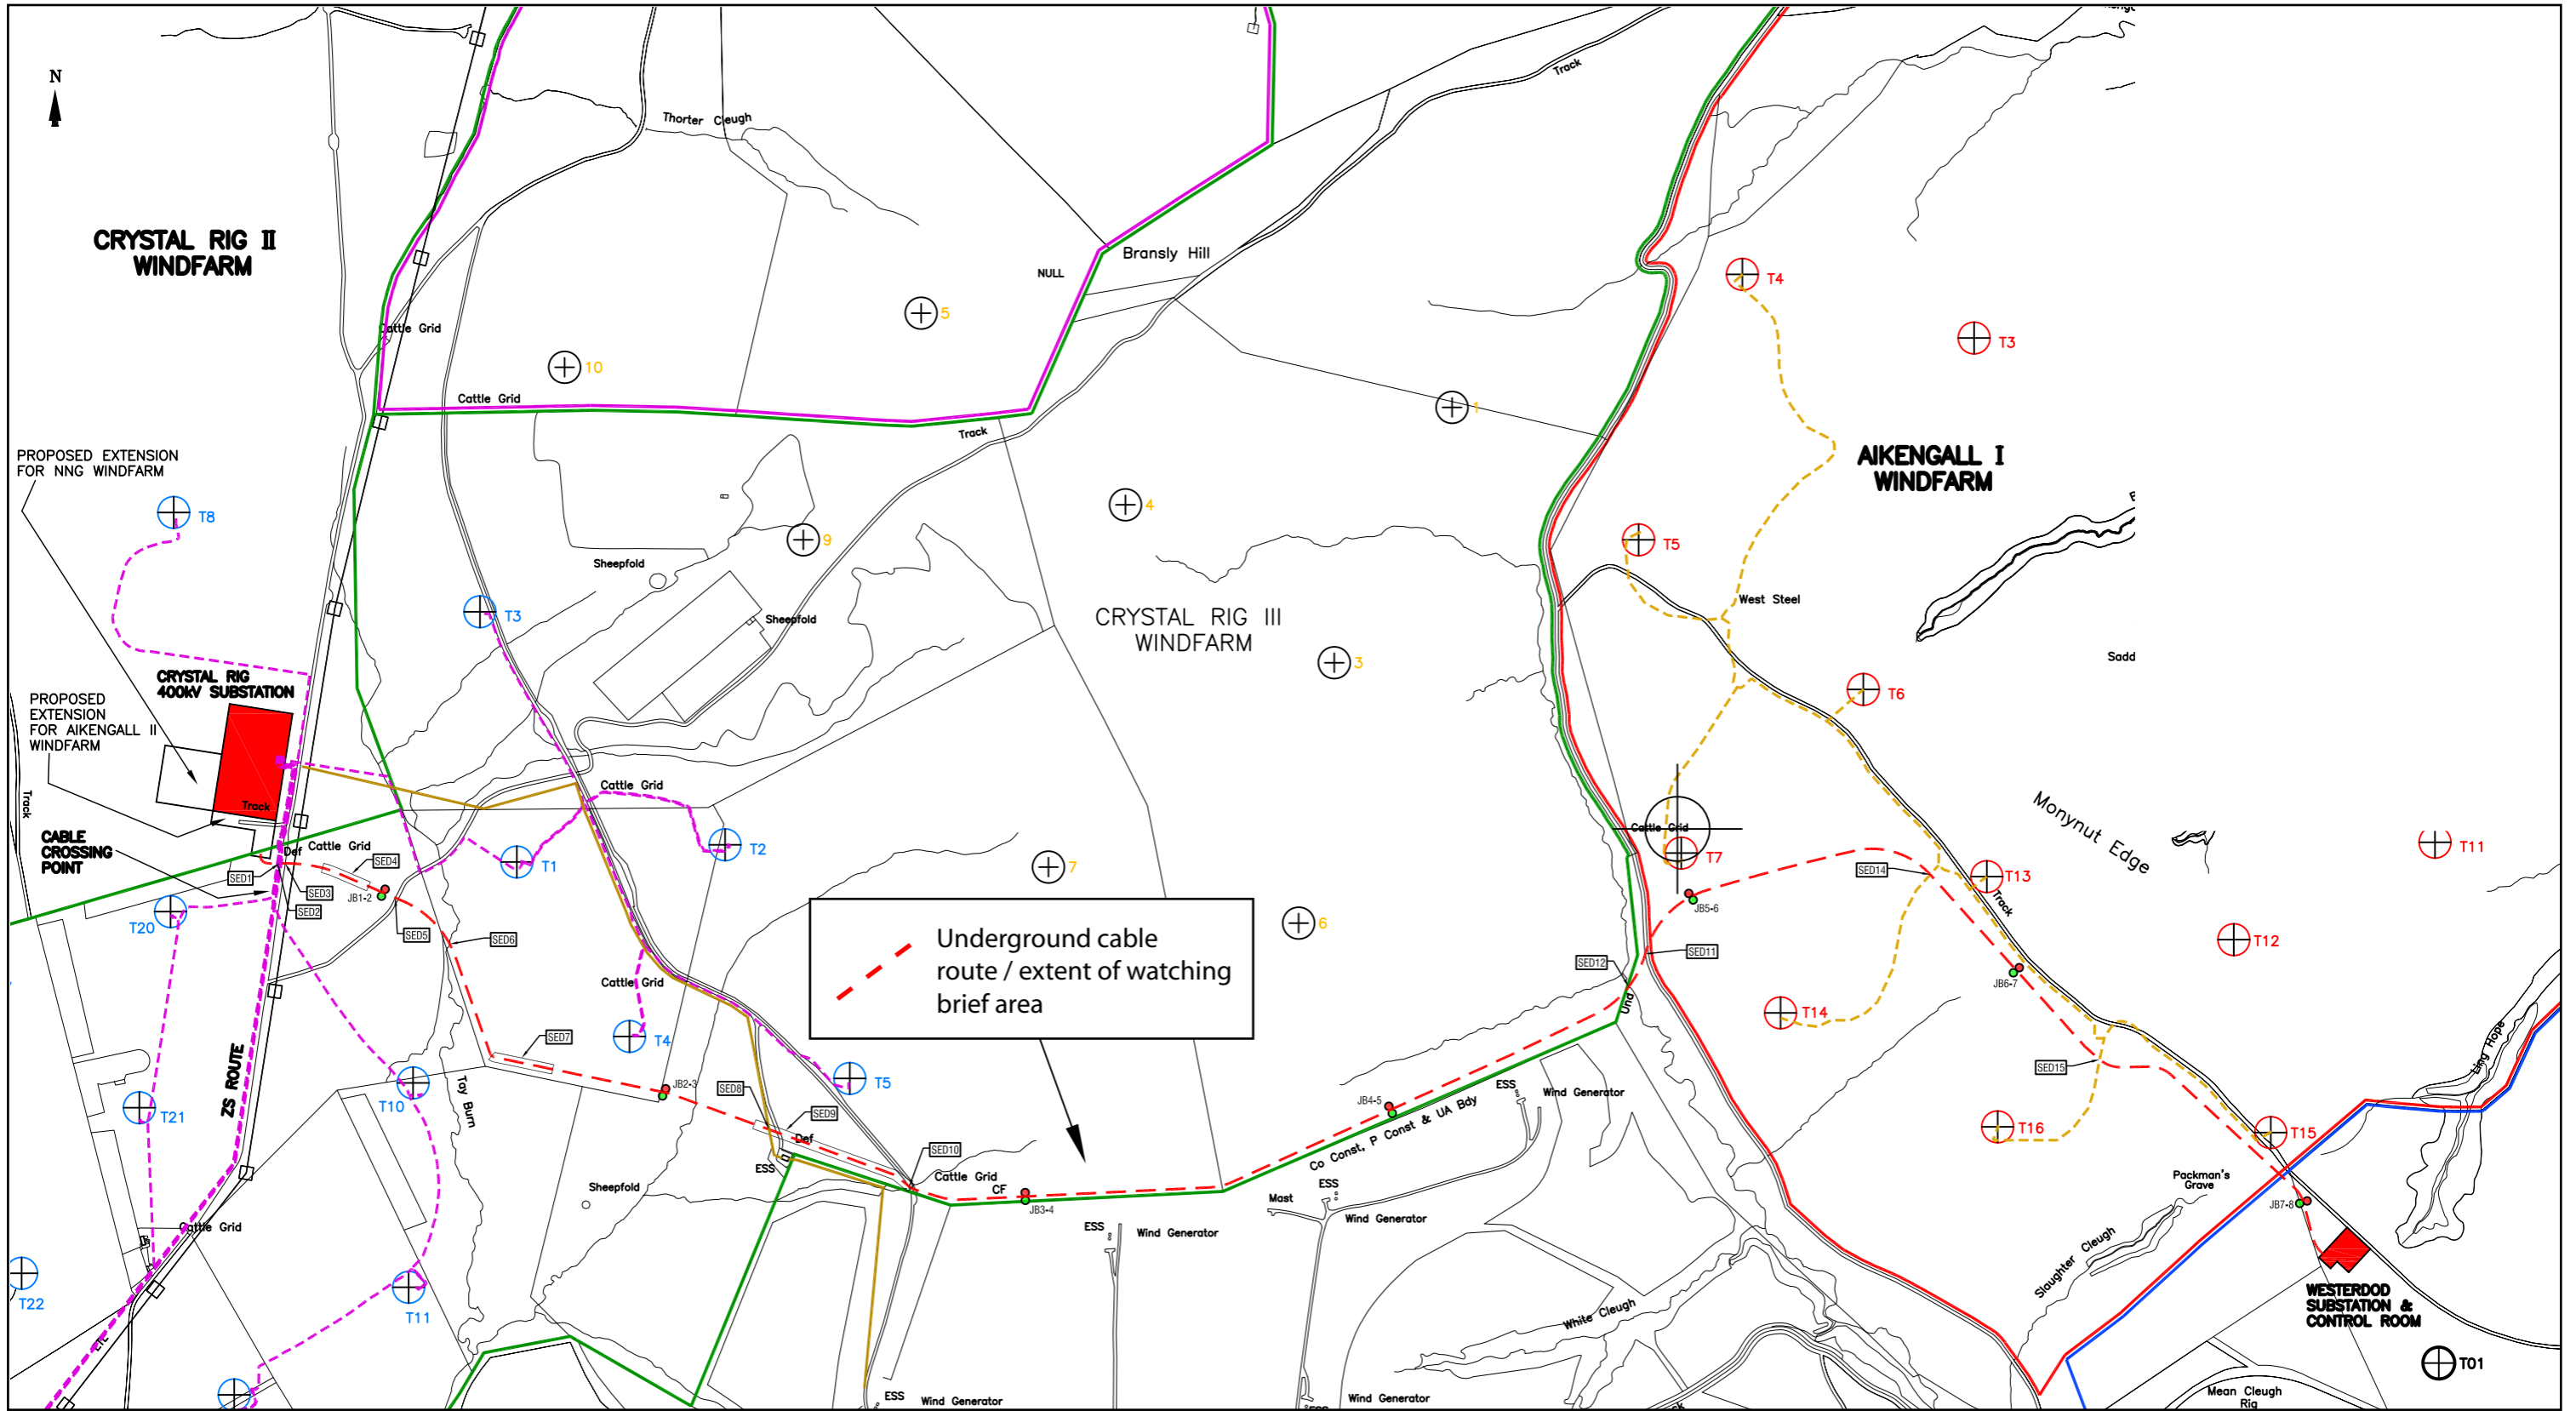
Site plan showing the cable route and the extent of the watching brief area (site base plan supplied by Iberdrola)
